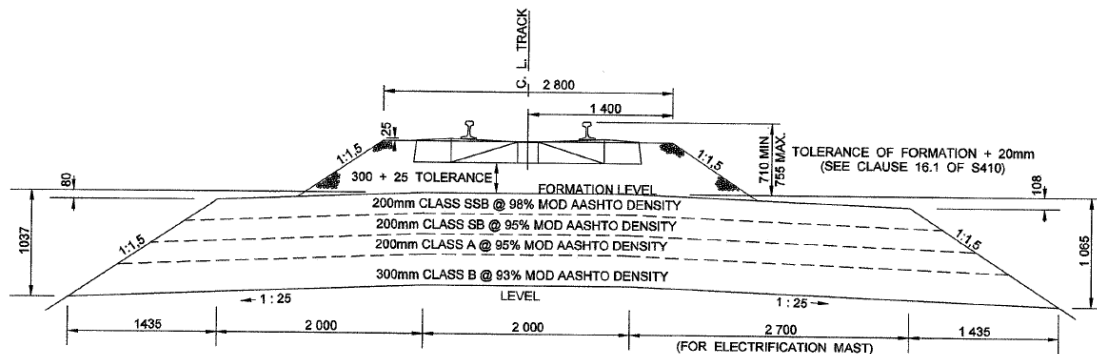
Typical conventional track structure on Majuba Rail Corridor
